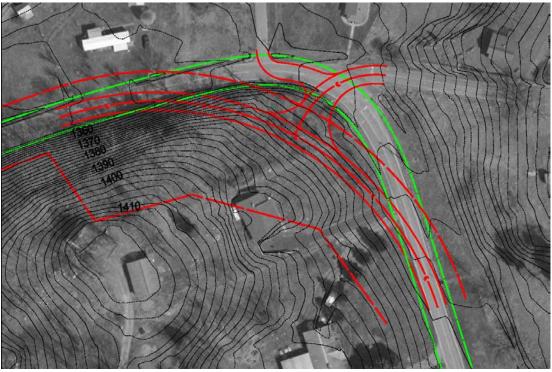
Plan View of Curve on Poplar Grove Road at Twin Hill Road Intersection
